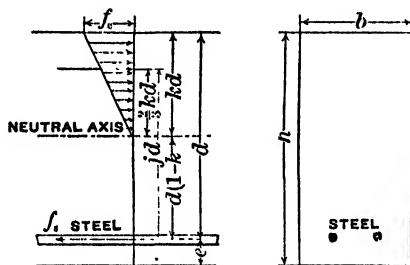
Resisting Forces in a Reinforced Concrete Beam. (See p. 751.)
